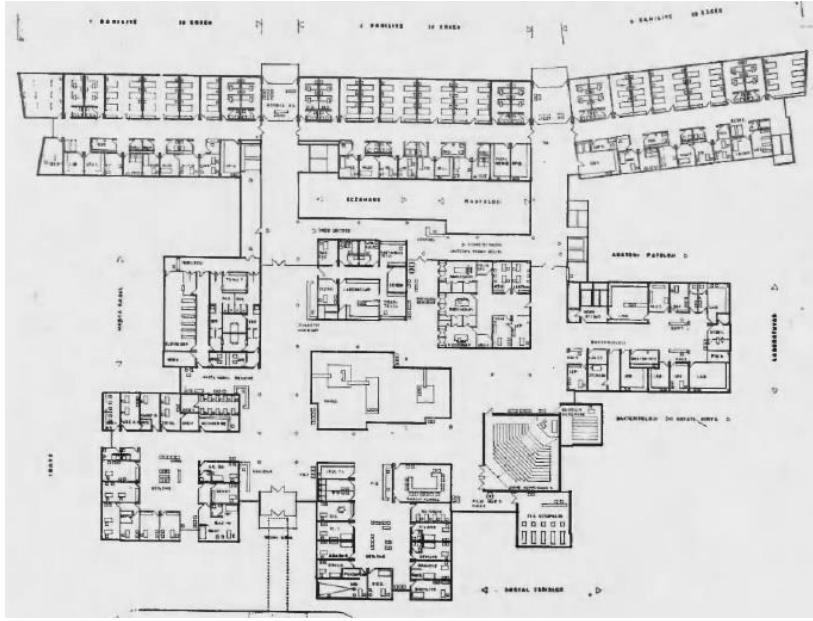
Ground Floor Plan, Social Insurance Institution Beyoğlu Hospital
